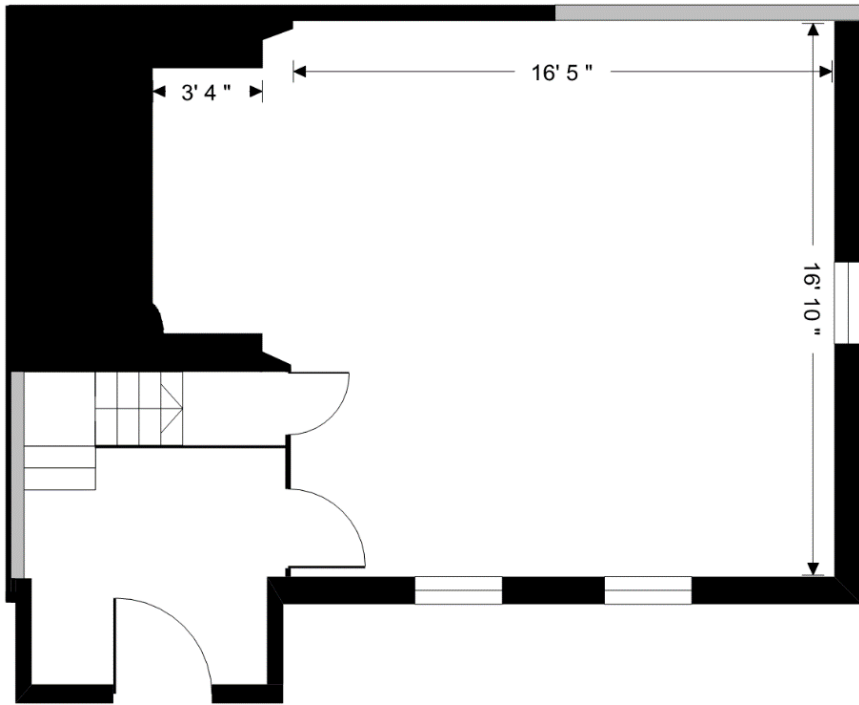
Current configuration of the rooms that comprised the ground floor of the original Thomas Kilham House.⁸⁸
